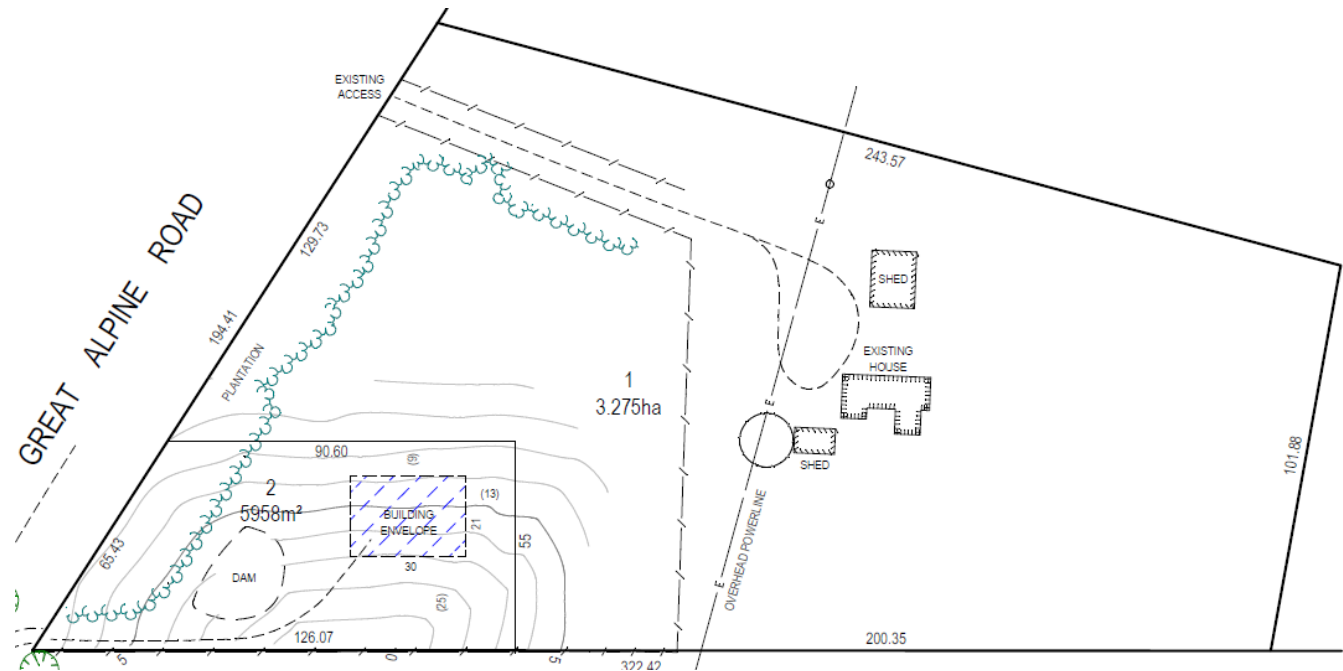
Proposed Plan of Subdivision – Austec Surveying
